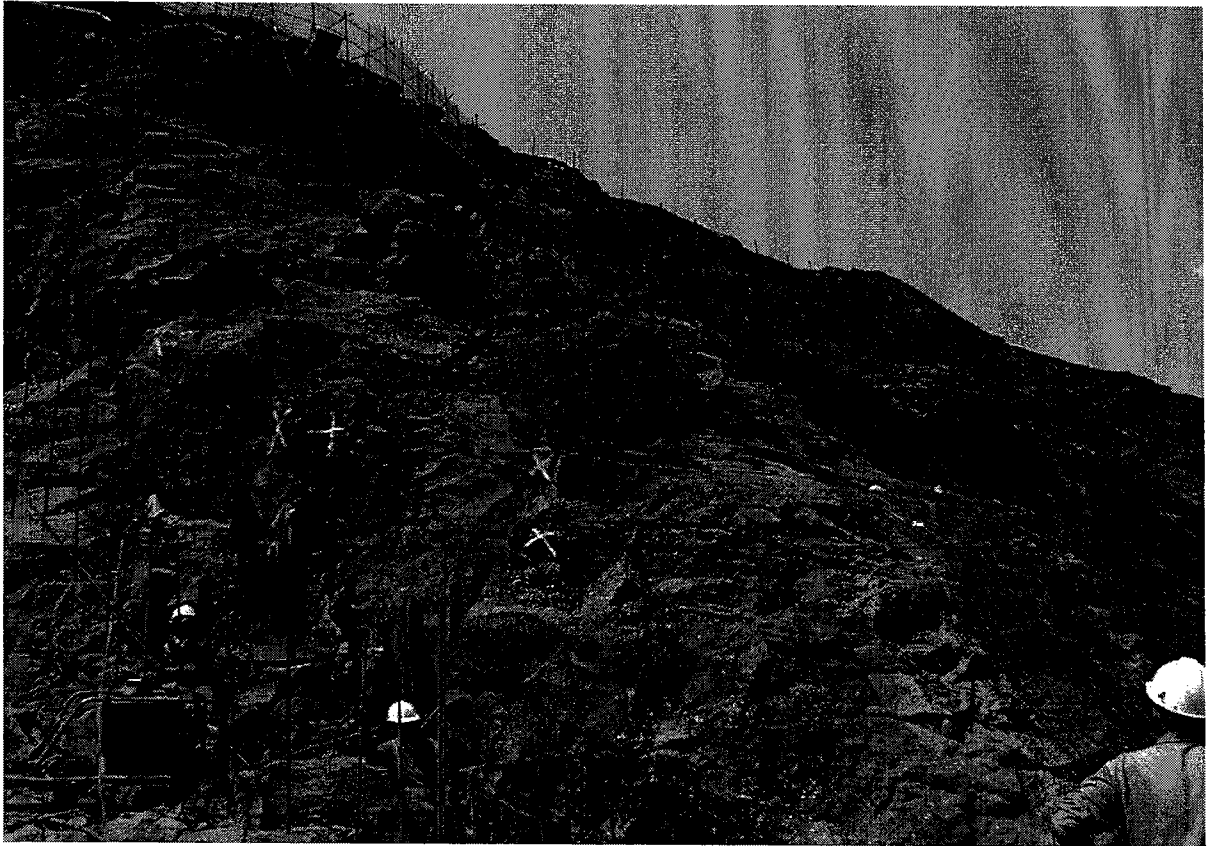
Slope Stability. Reinforcement at Compensation Foundation
